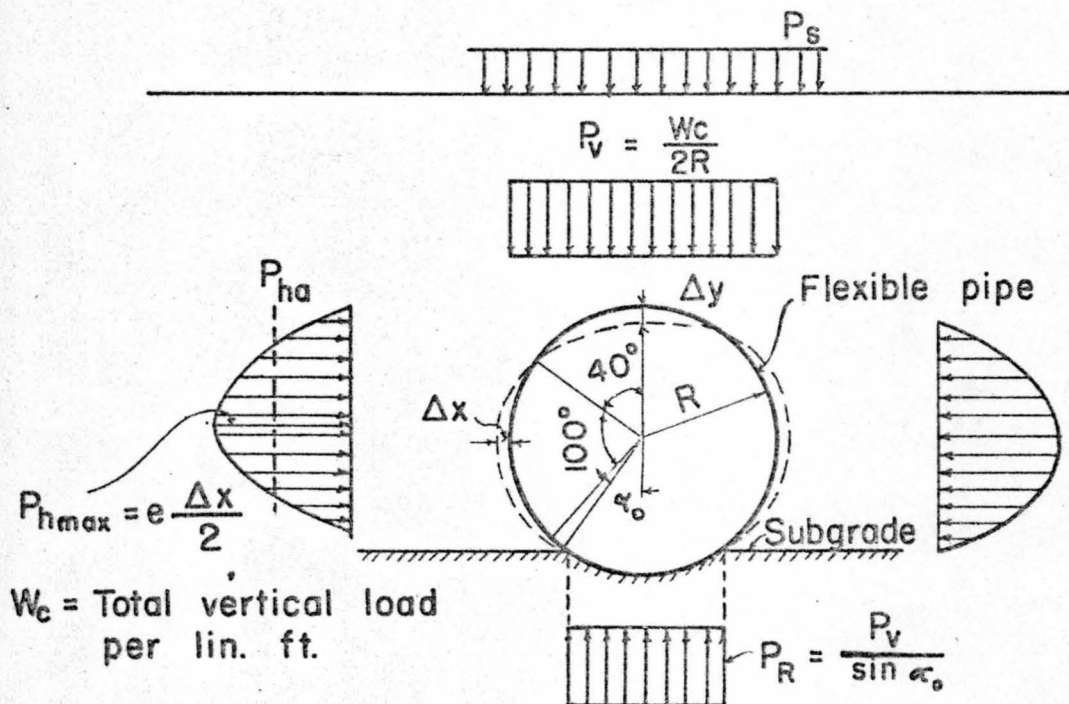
PRESSURE DISTRIBUTION ON FLEXIBLE CONDUIT TYPE SECTION
